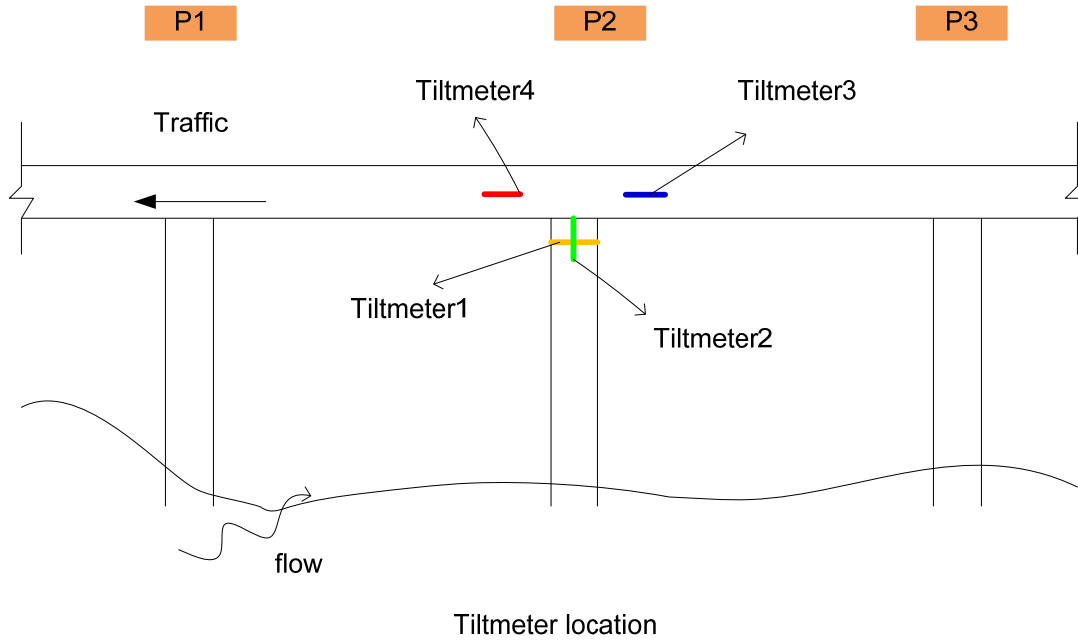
Layout of the Tiltmeter Location on SH80 over San Antonio River Bridge.
